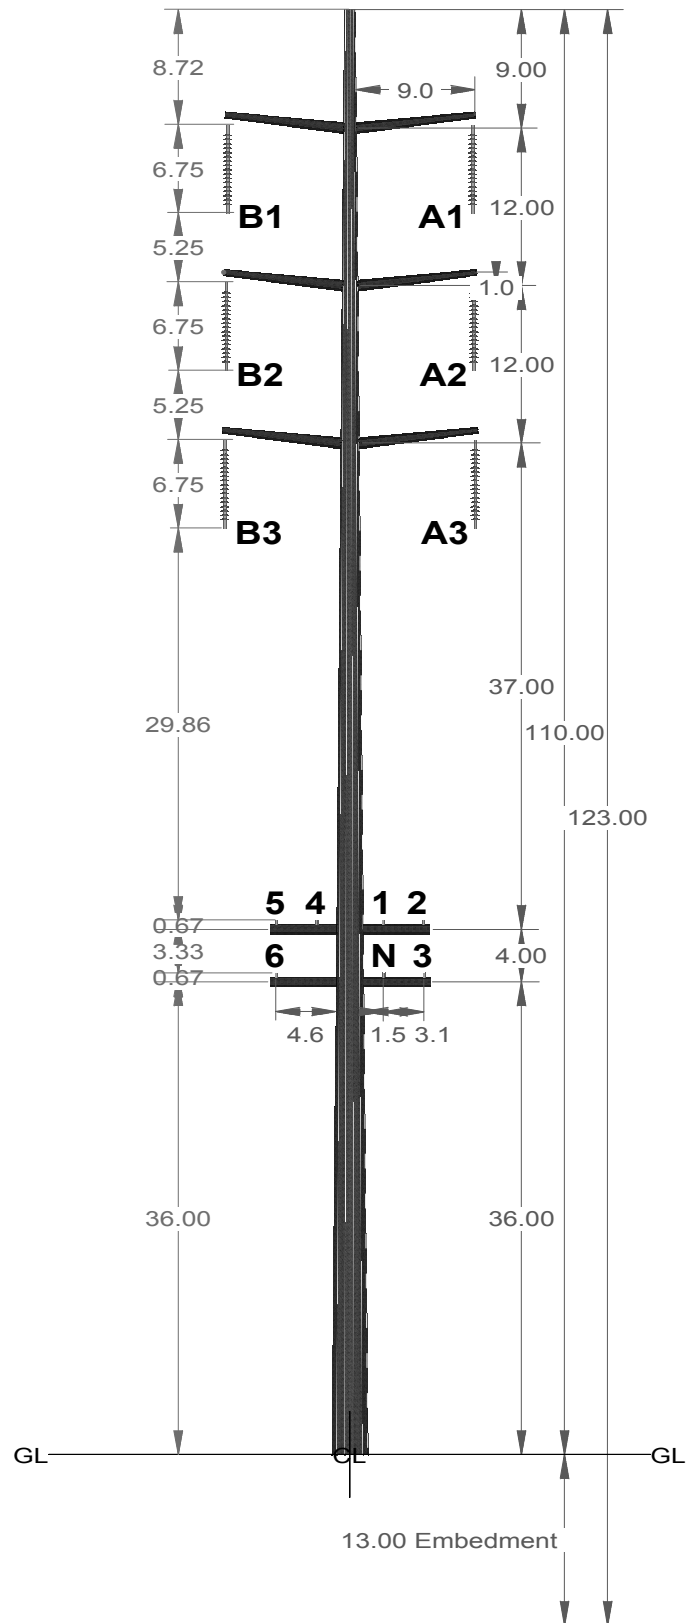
138 kV Steel Structure with Distribution Underbuild Typical Drawing
